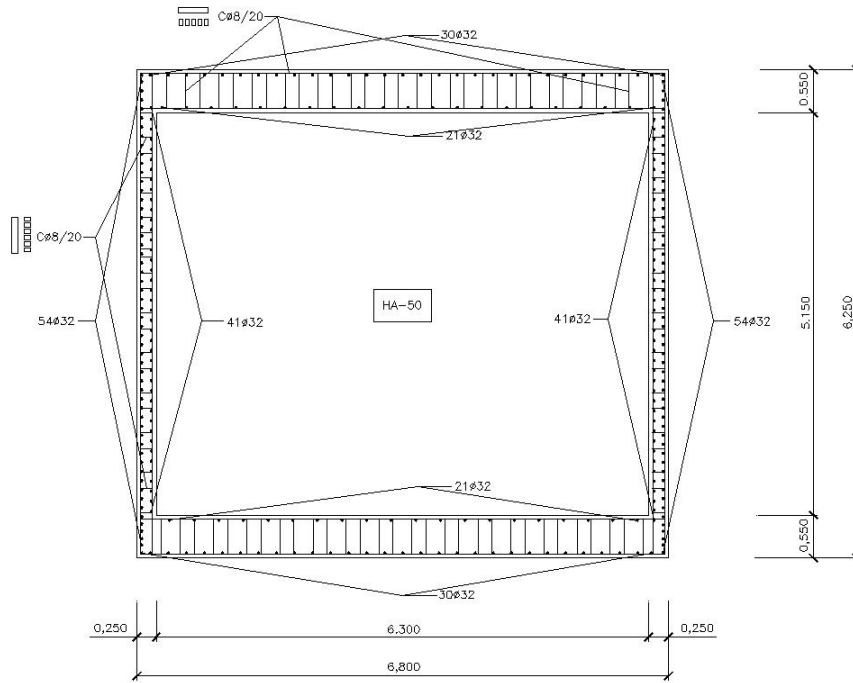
Bottom cross-section for the 40 m span viaduct and 100 m pier height
